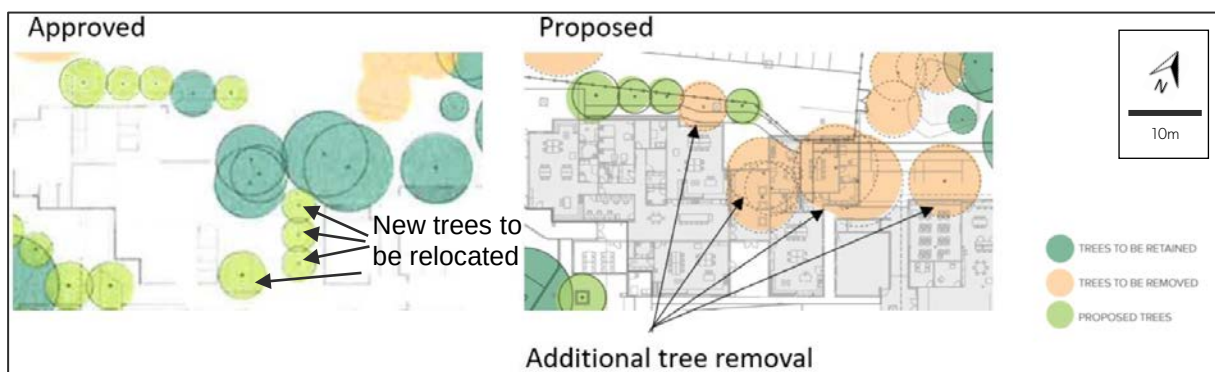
| Proposed and approved tree removal (source: Section 4.55 Modification Application, 2019)
